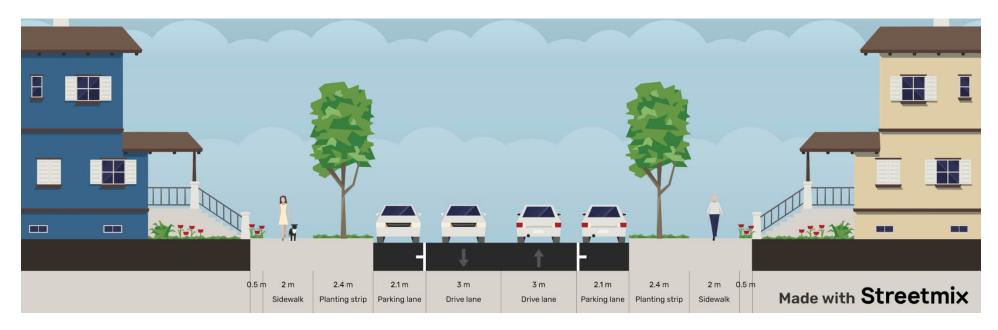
Local Road (20 m Right-of-Way) On-Street Parking (Both-Sides)
